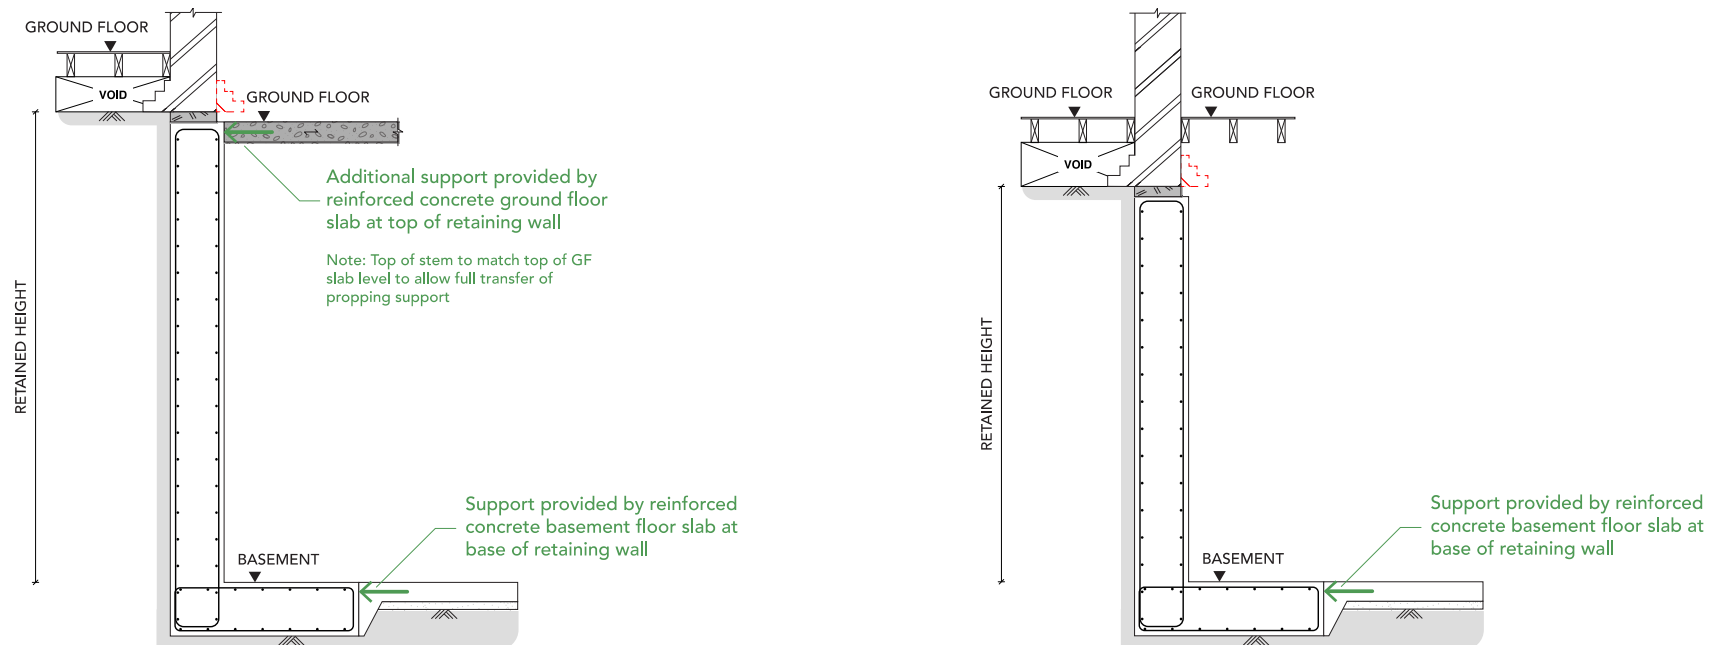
Schematic diagrams showing support conditions of propped (left) and unpropped (right) retaining walls.
